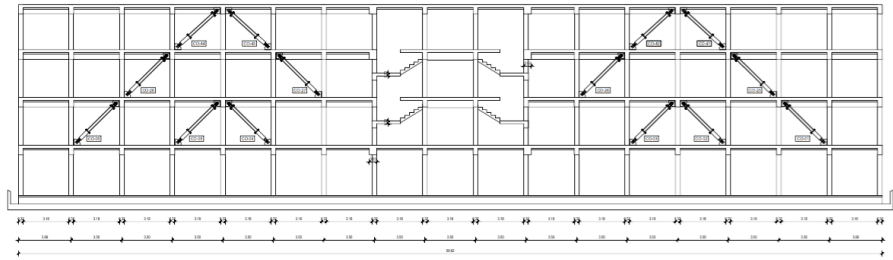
Typical longitudinal frame of the building structure with dissipative braces
